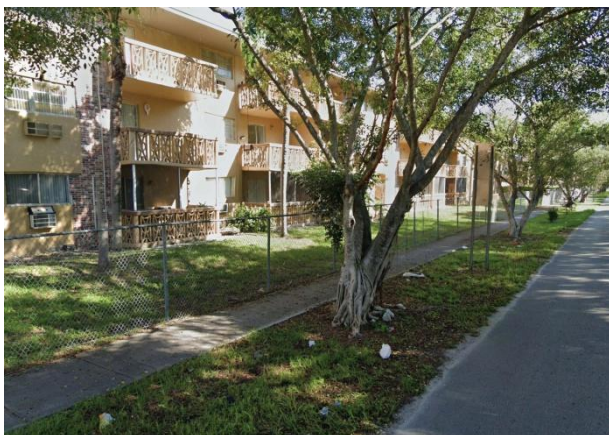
This photographic evidence shows outdated building structures and deterioration of site. Exterior AC units can detract from the overall appearance of a building and site, as they can be bulky, noisy, and visually unappealing. They may also require more maintenance and be more susceptible to damage from weather conditions, vandalism, or theft when located outside. The presence of exterior AC units can suggest that the building's cooling system is outdated or inefficient, potentially leading to higher energy costs and environmental impact.
